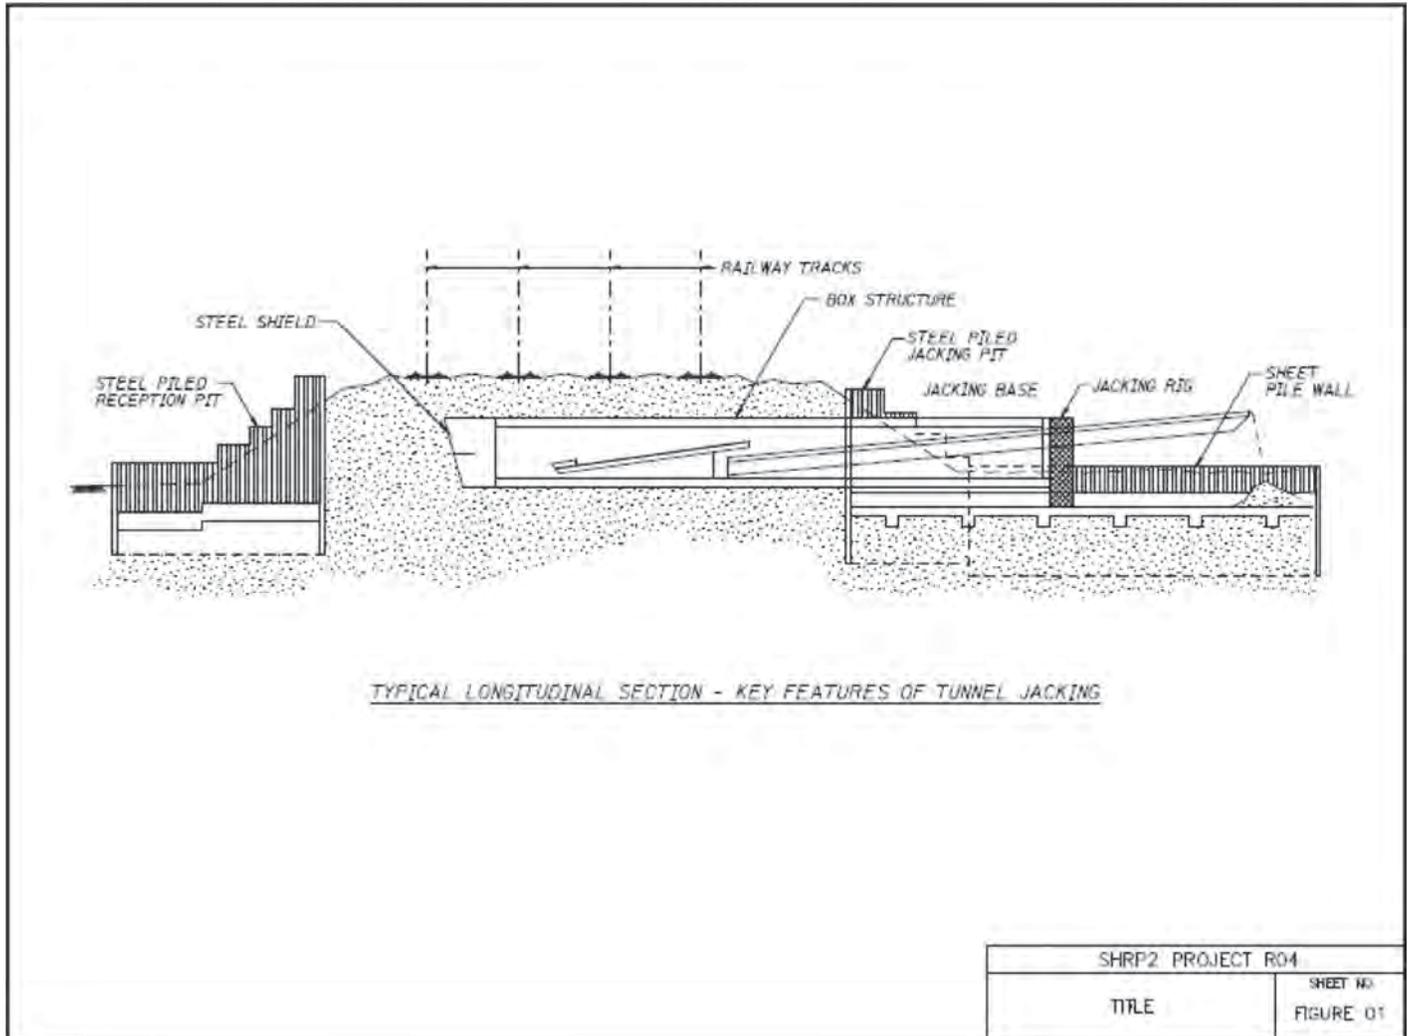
Tunnel jacking, typical longitudinal section, Example A.
